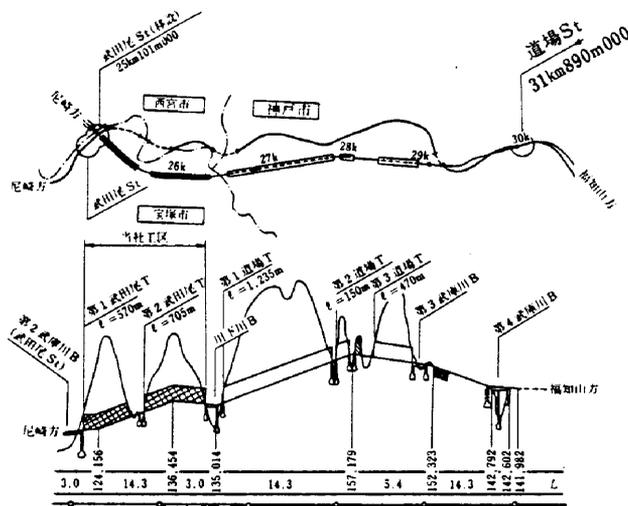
Plan and section of Takedao tunnel (from Takedao to Dojo)
